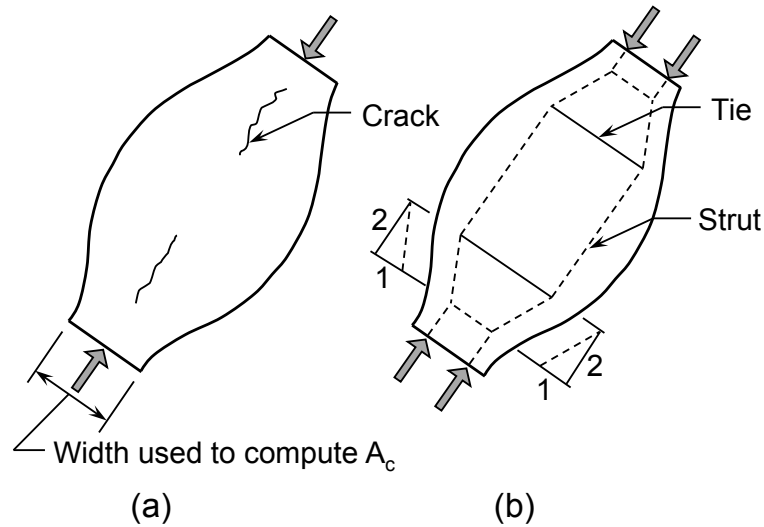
Bottle-shaped strut: (a) cracking of a bottle-shaped strut; and (b) strut-and-tie model of a bottle-shaped strut (ACI 318-08).
